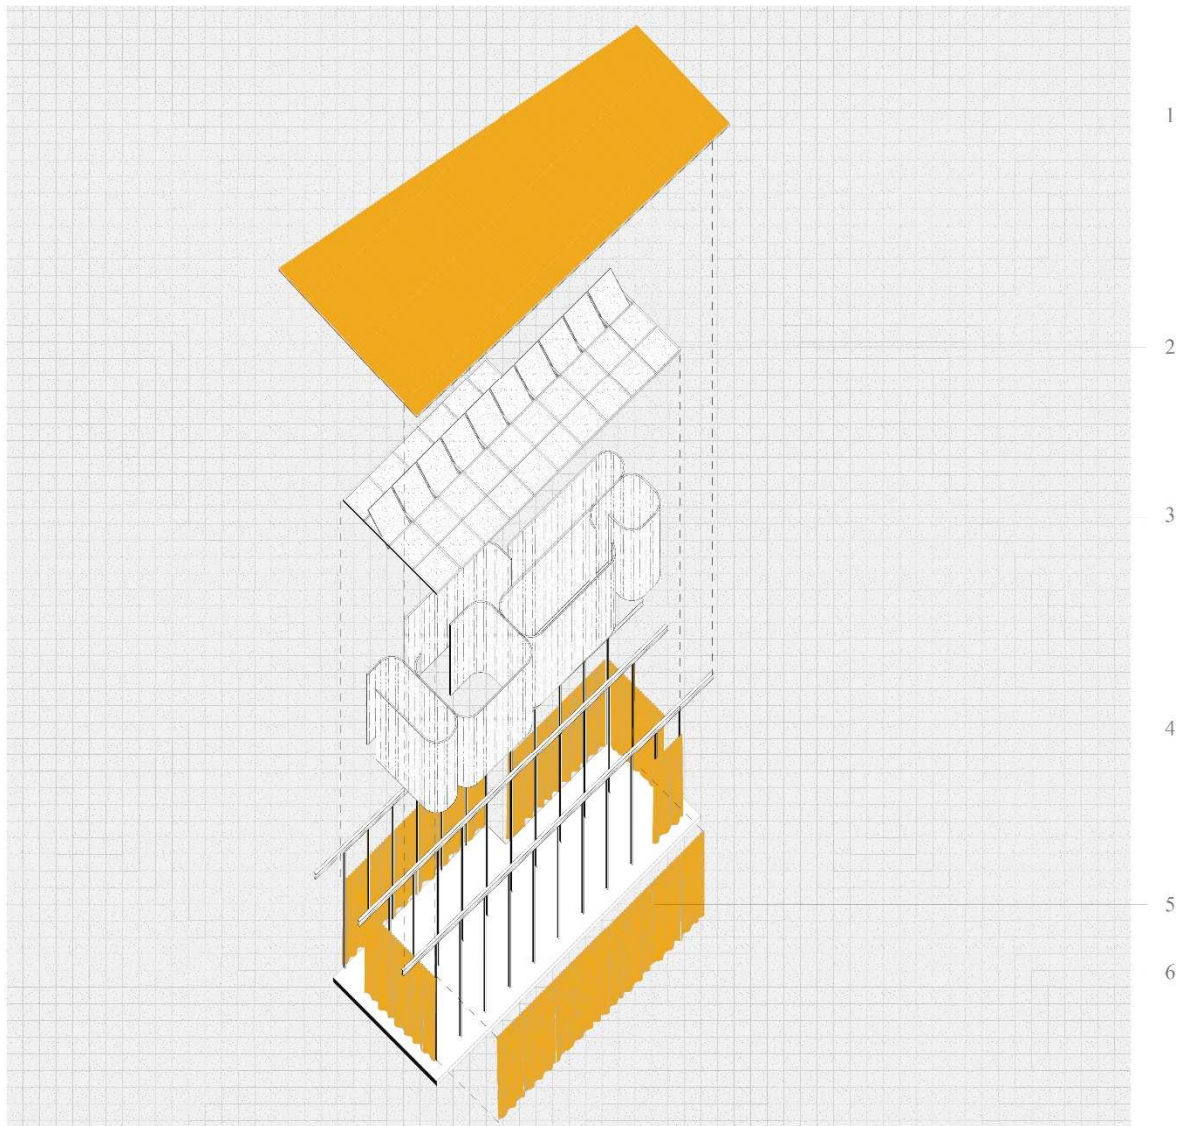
Toilet prototype*, 1) Roof panels 2) Ventilated roof 3) Internal partitions 4) Roof structure 5) Thermal curtains 6) Technical Floor, Marco Giribaldo
